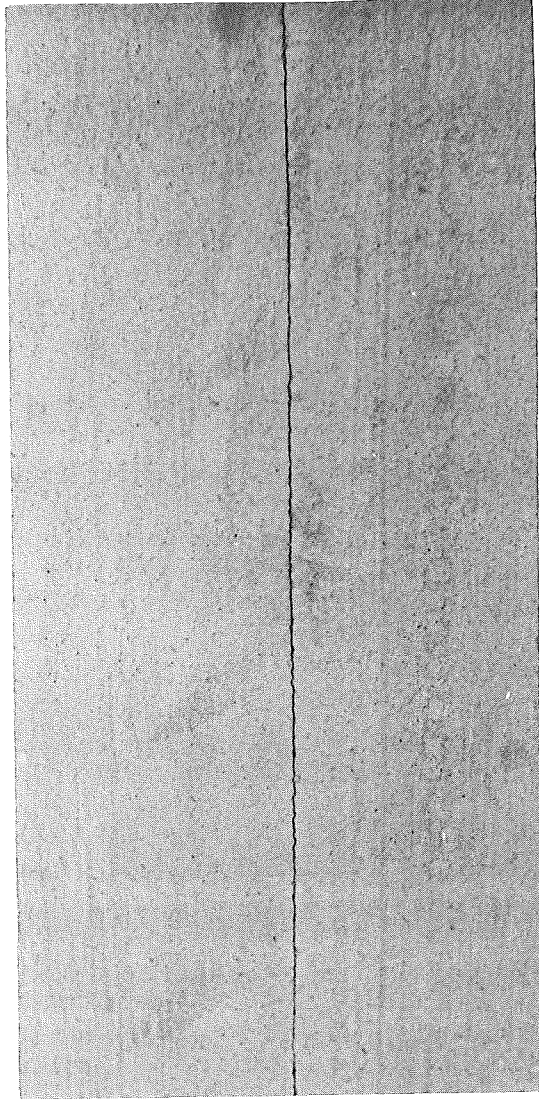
Neat appearing joint in standard pavement on I 70, Ohio.
